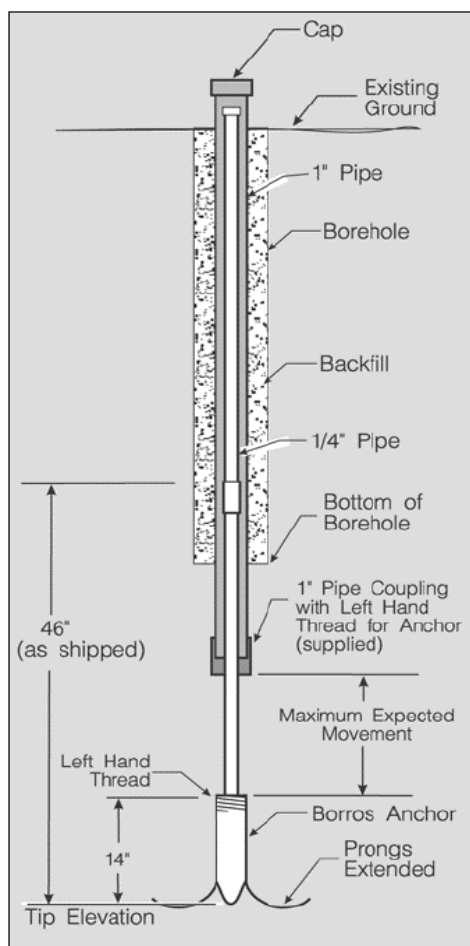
Typical Settlement Point with Borros-Type Anchor
